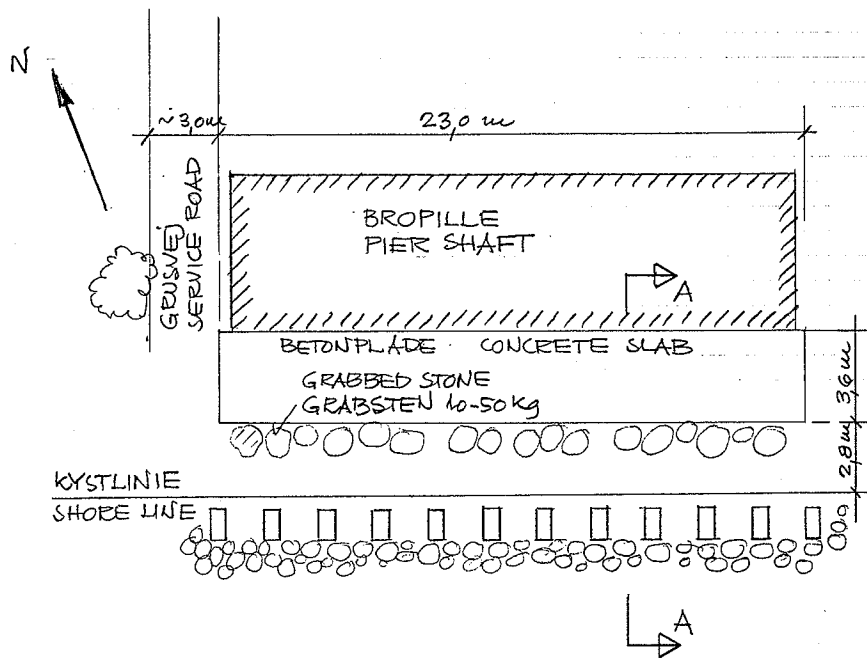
Exposure site, the Old Little Belt Bridge, Snoghøj, plan 1:300.
